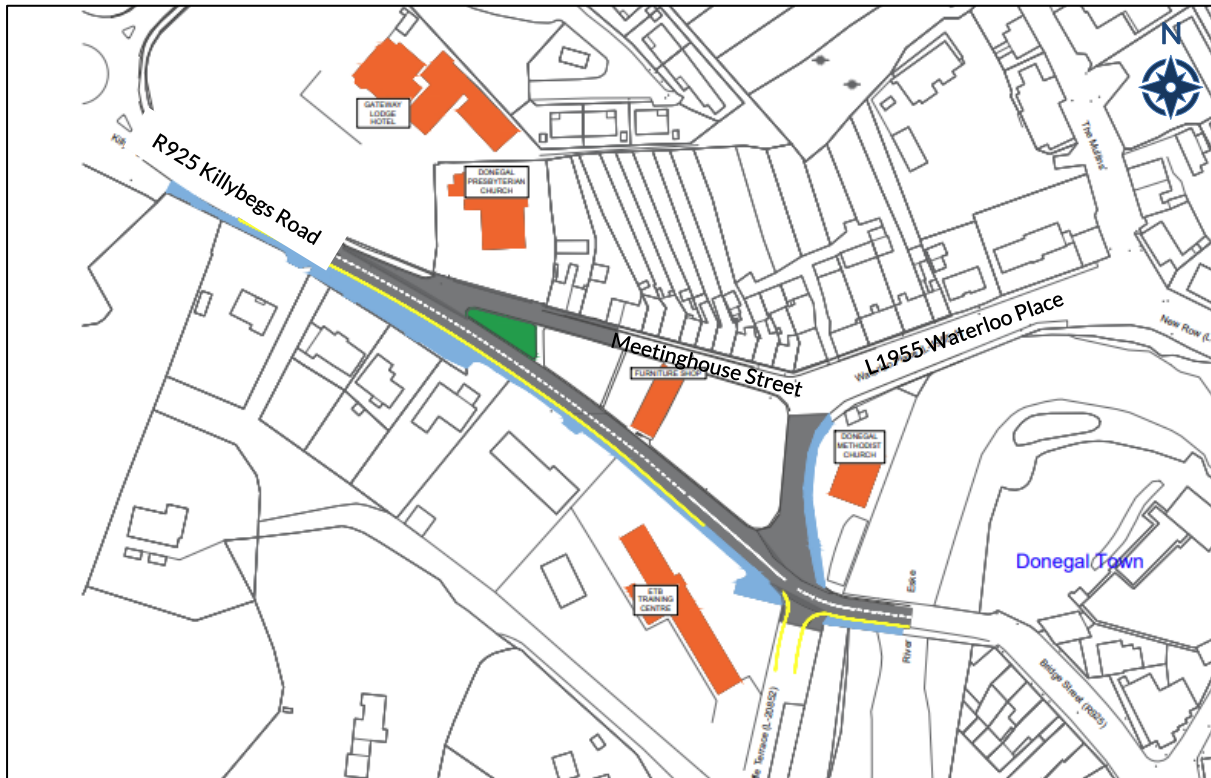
Plate Layout of The R925 Killybegs Road - Layout Map of existing alignment (Dwg. No. 11199-3-004-D01)
